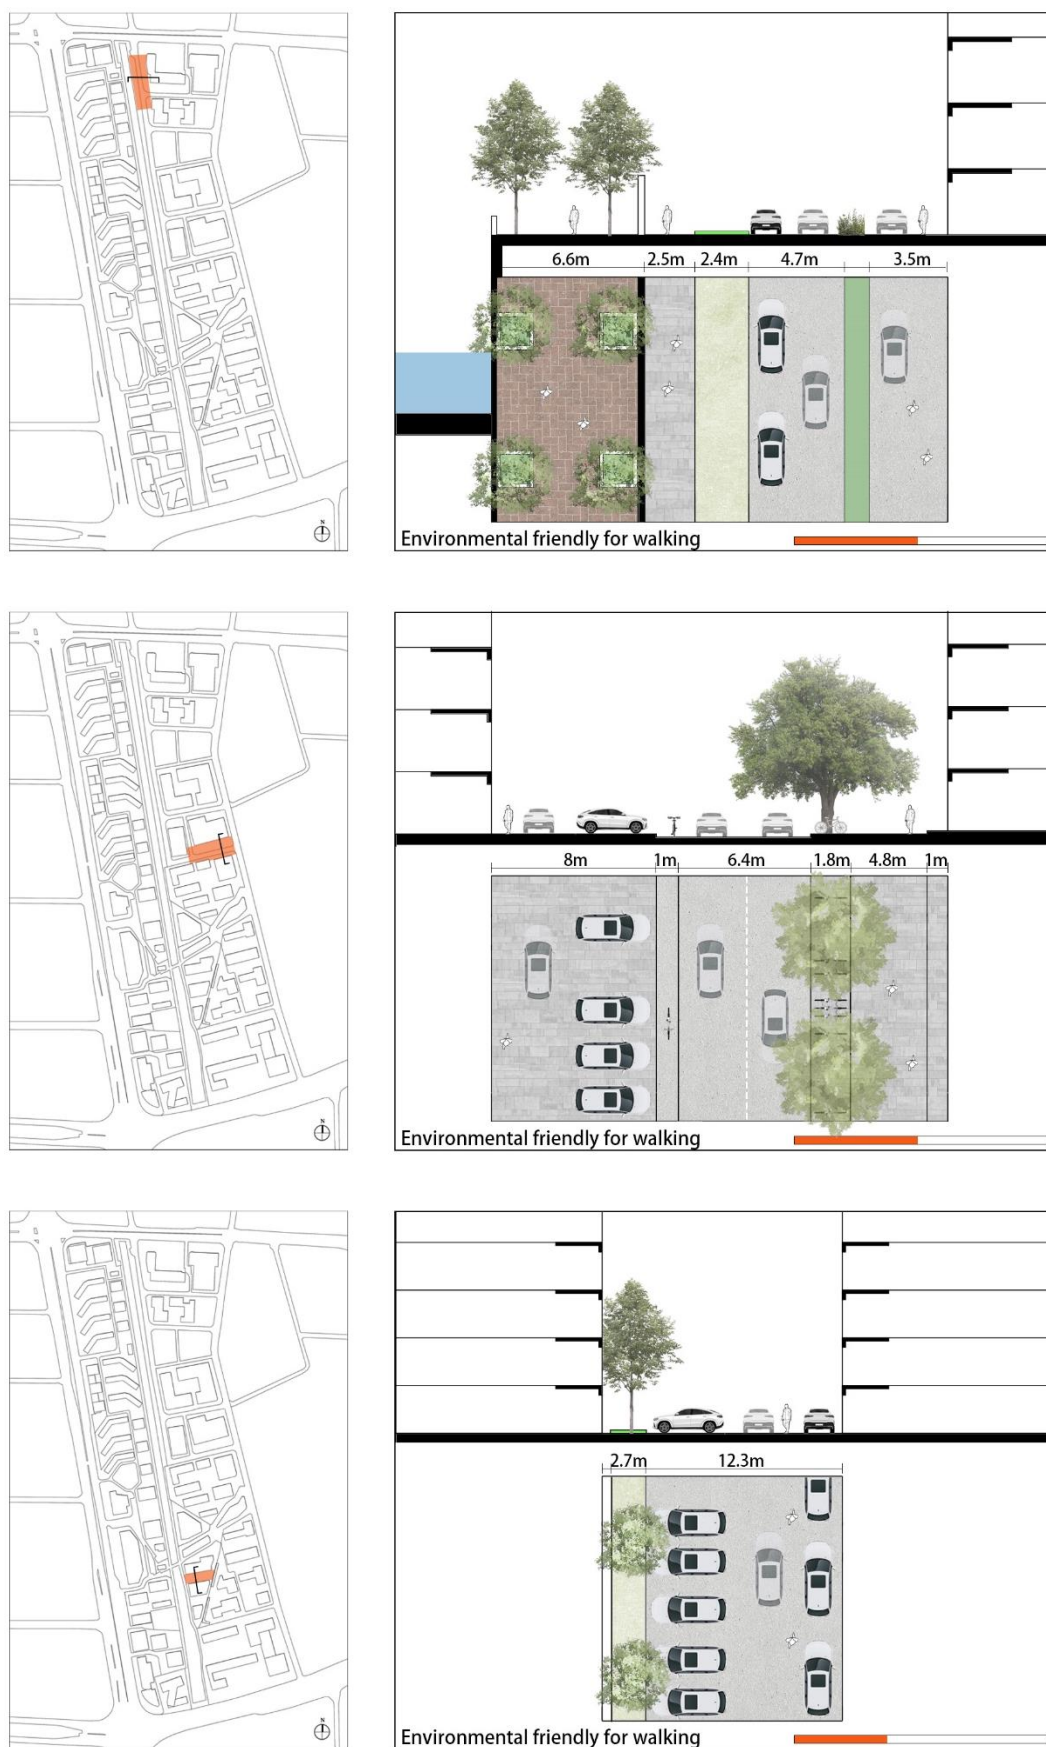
Street Cross-Sections Before Improvement of the East Plot
